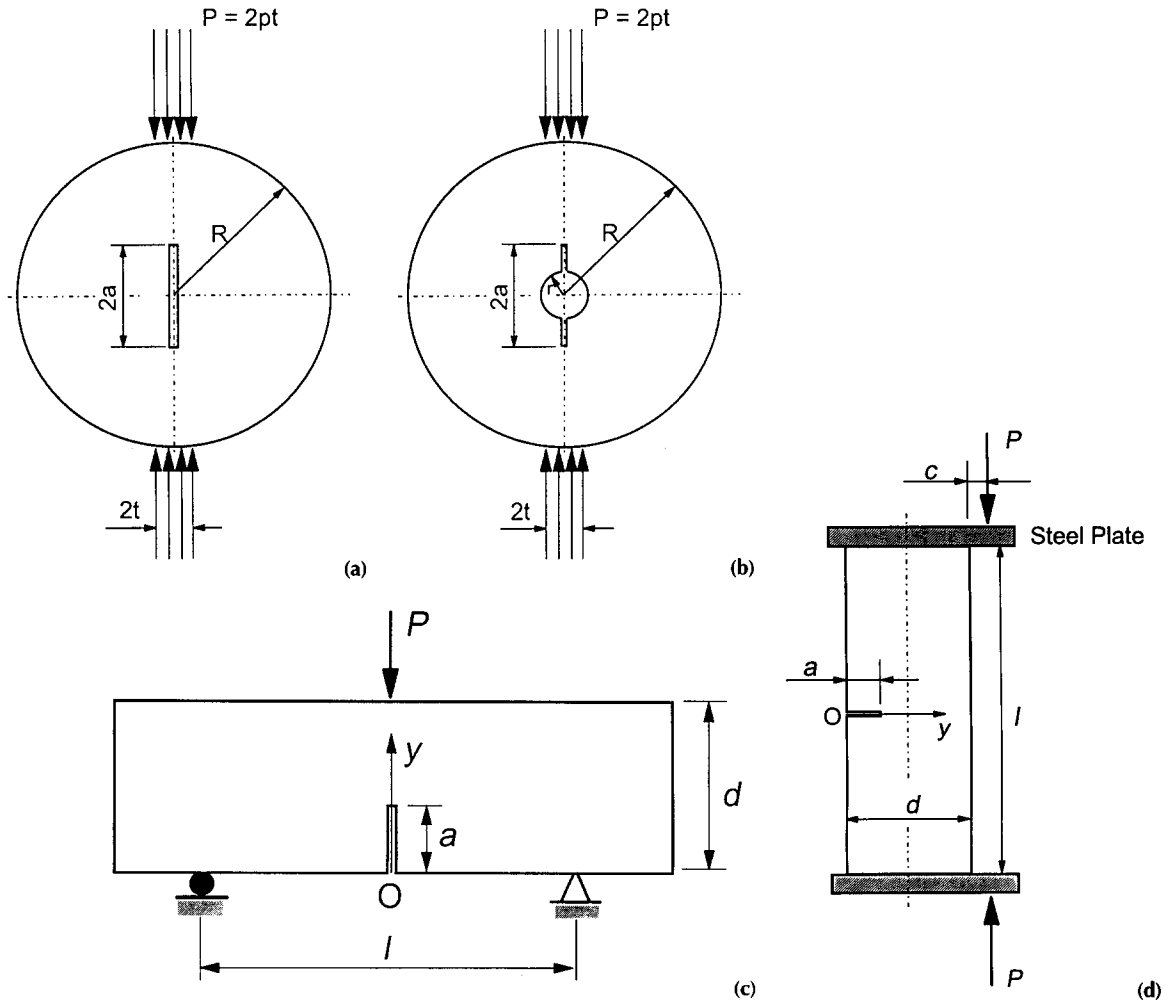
Fracture test specimens. (a) Regular splitting tension cylinder; (b) holed splitting tension cylinder; (c) three-point bend beam; (d) eccentric compression prism.
